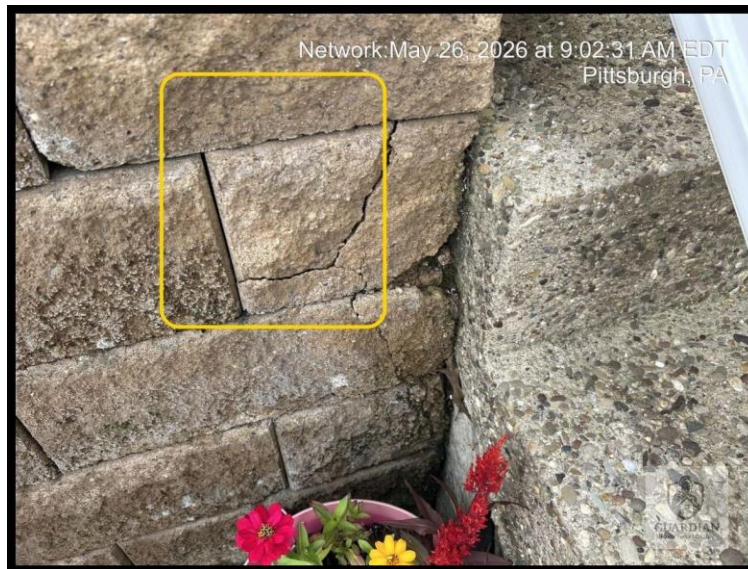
The left-facing retaining wall along the driveway showed cracked brick/masonry units, as visible in the wall face.
